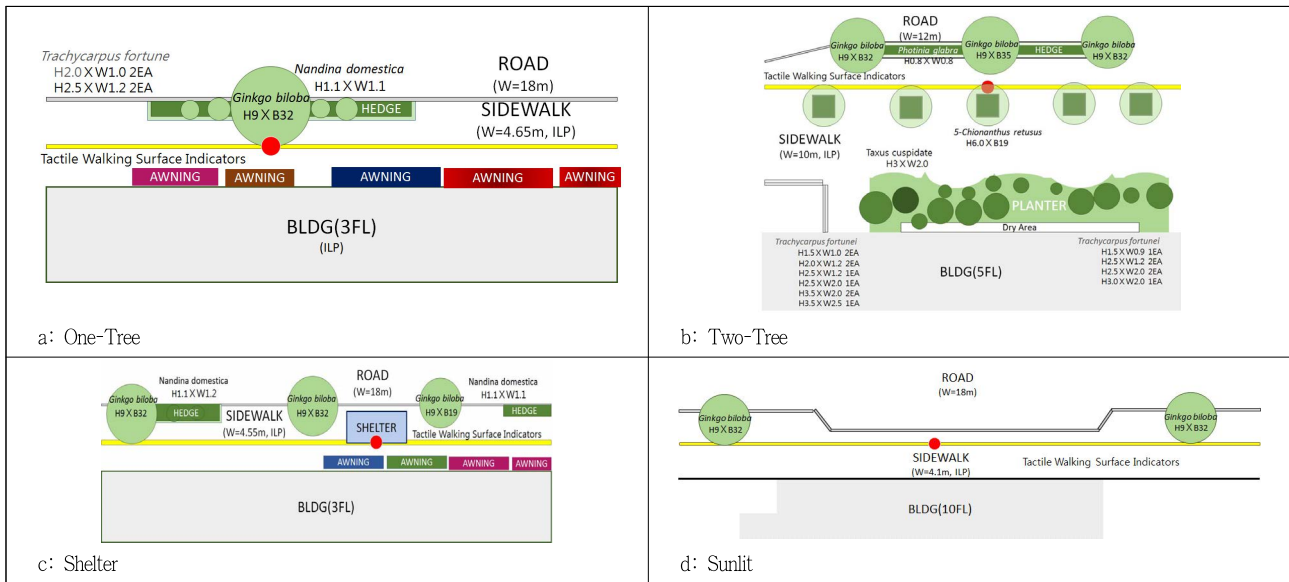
Plans of the One-row, Two-row, Shelter, Sunlit Station at the North Sidewalk Dongjin Street
